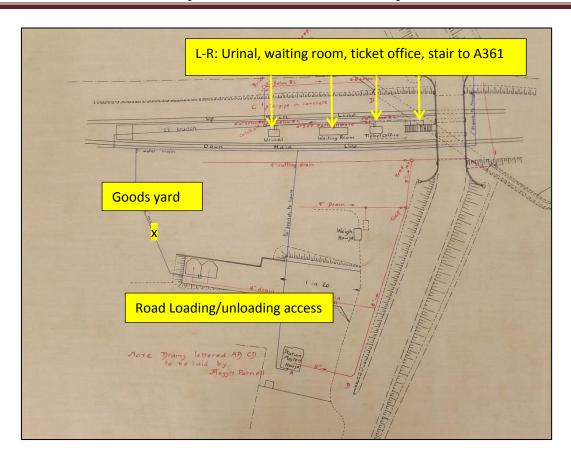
The former station area with platform. Only the Stationmaster's house, at the foot of this plan, survives. The uncovered Goods Yard building is not shown on this plan but stood at about X.
